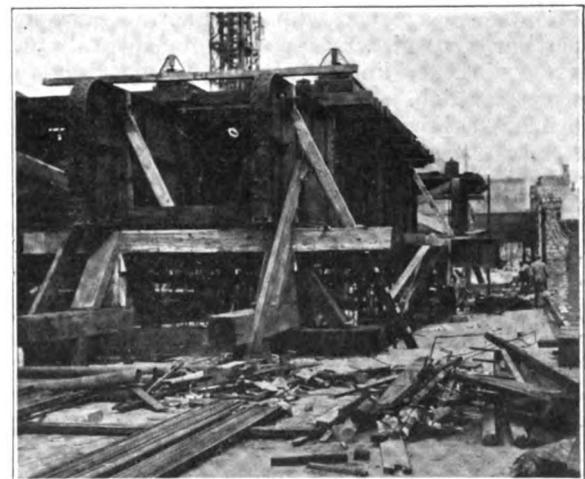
Temporary Supports for Overhanging Girders, as Shown in Fig. 4.
